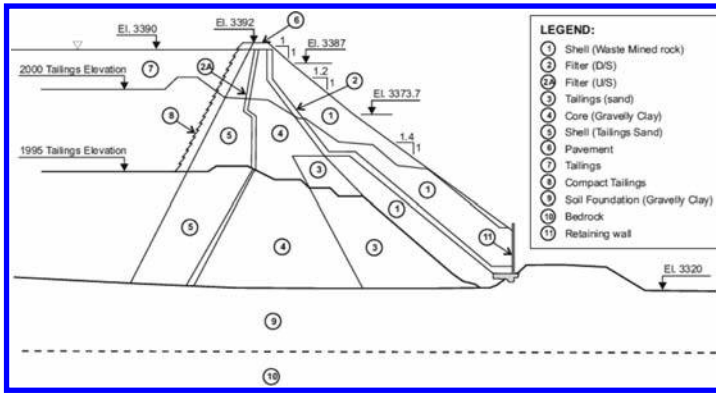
Current typical maximum cross-section of the Tlacacayan Tailings dam.
